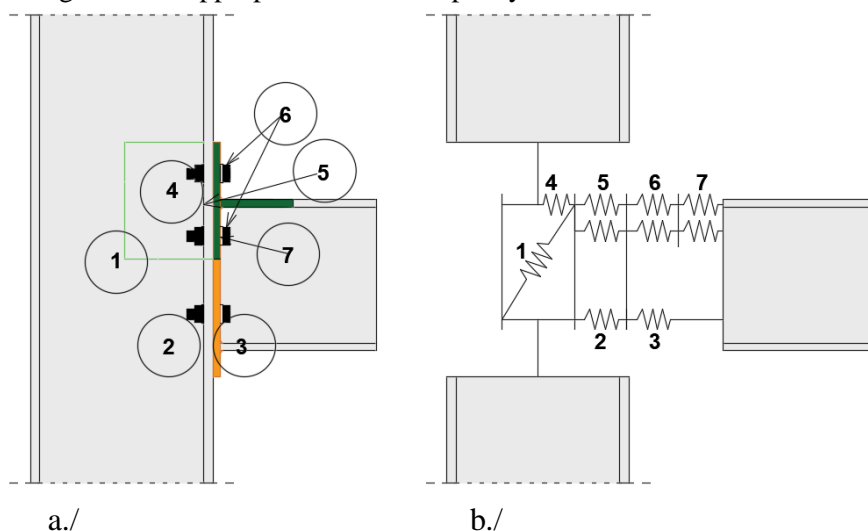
extended end-plate Steel joint a./Bolted beam-to-column connection and b./ component method
